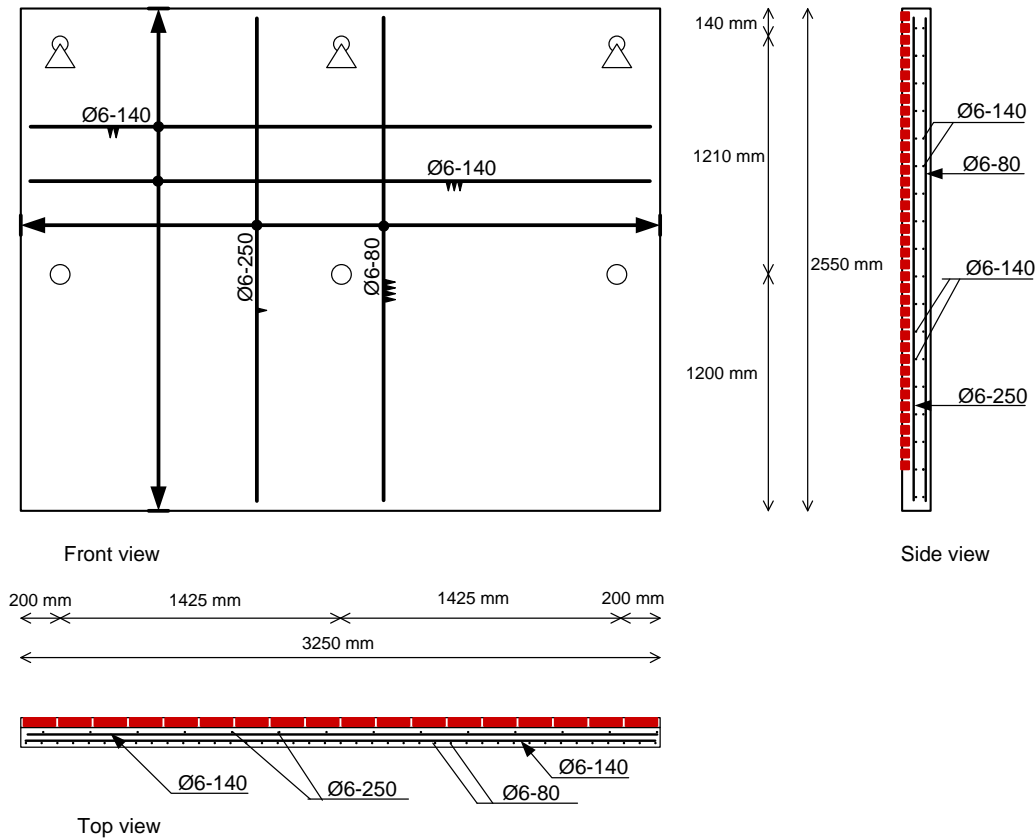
Technical drawing of BFRP-bar design (front, top and side view)
